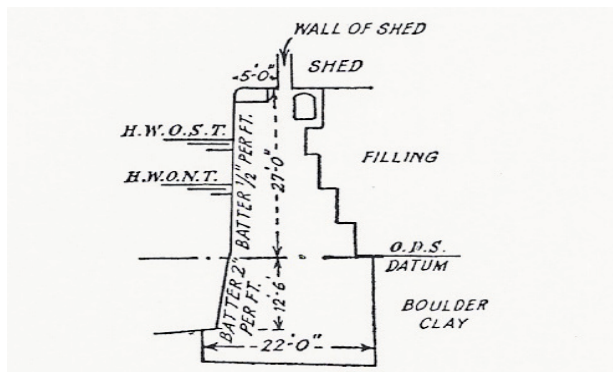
Cross-section of Langton Dock Wall, Liverpool 1881 [Duplat Taylor 1949]
